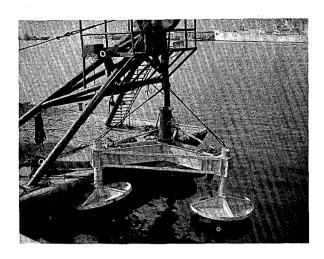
Bottom-mounted complex utilizes explosive embedment anchors to lock the bearing pads to the seafloor.
